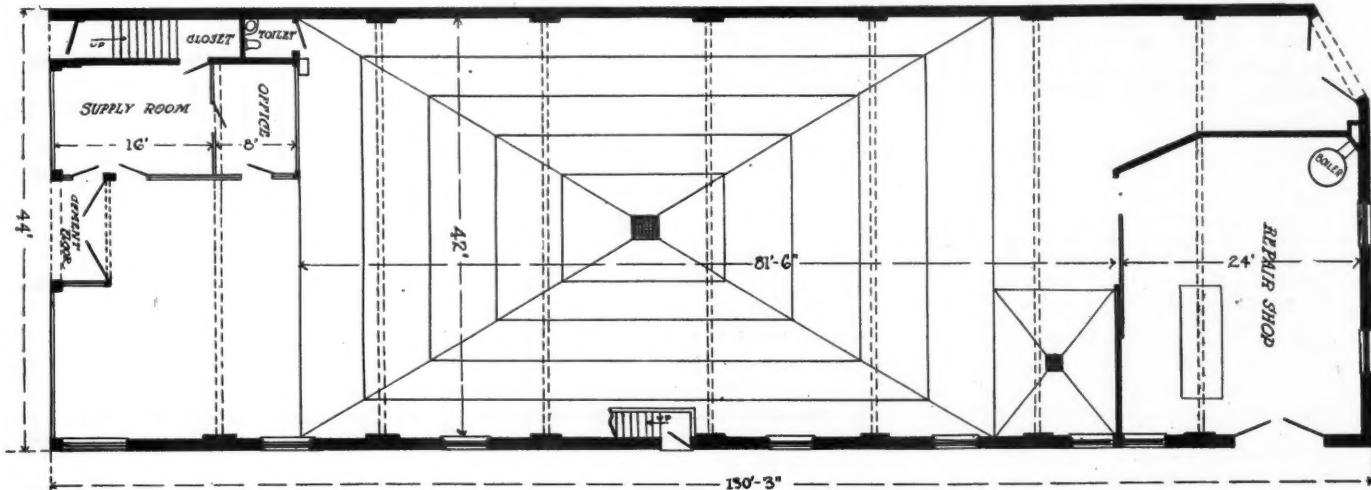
FLOOR PLAN OF GARAGE SUITABLE FOR A SMALL CITY. THE SALESROOM, SUPPLY ROOMS, REPAIR DEPARTMENT, ETC. ARE ALL ON ONE FLOOR
